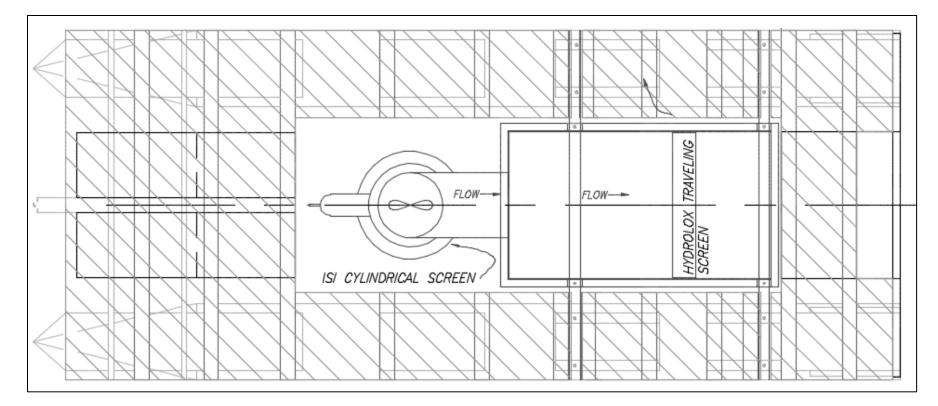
Plan view schematic of original floating test facility for ISI Cylindrical and Hydrolox Traveling screen testing.
